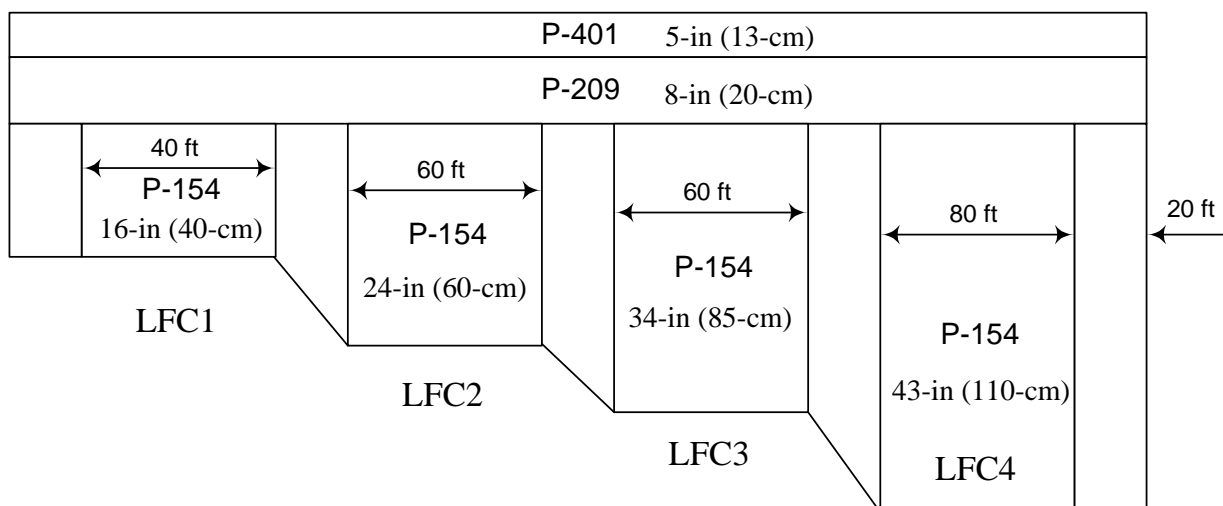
Construction Cycle Three (CC3) Pavement Cross-Sections
